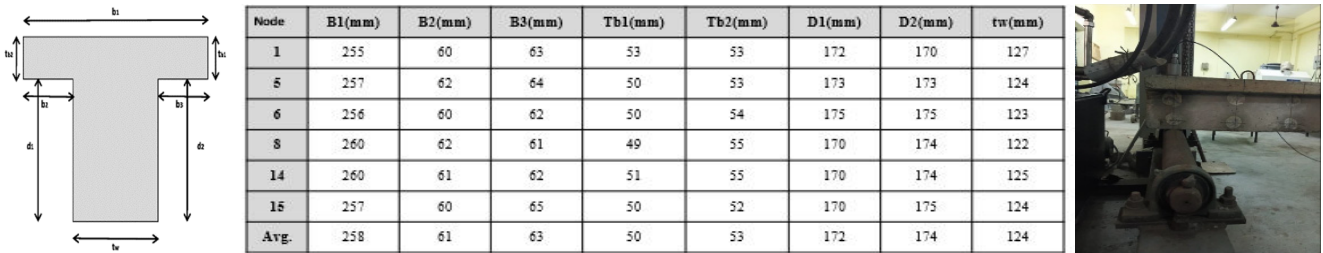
(a) Cross-section of RCC T-girder; (b) measurement of dimensions of the T girder; (c) tuned roller support.
